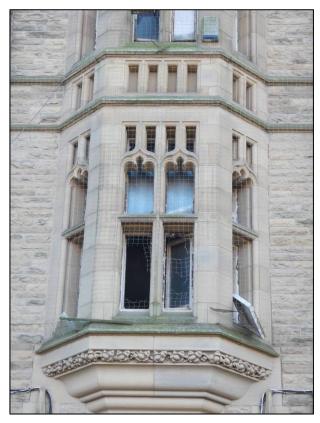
First floor oriel window to central tower (1F5), looking S (photo 1/752).
